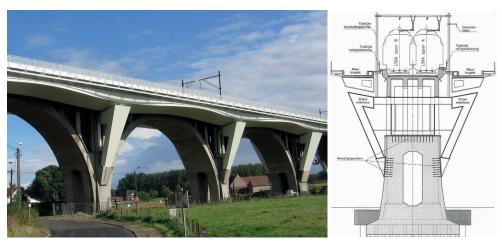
Final design of the integrated steel fly-overs: front view (left) and cross-section (right)
